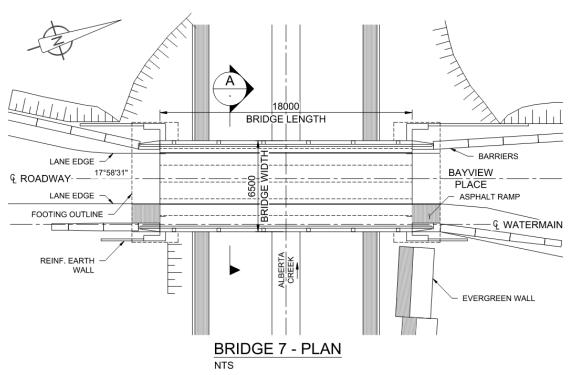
Bayview Place Bridge over Alberta Creek - Plan
